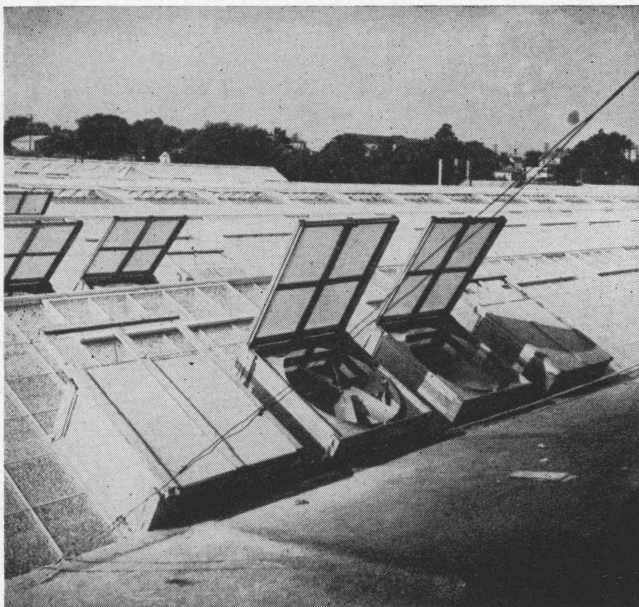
Exhaust fans mounted in greenhouse roof. Hinged lids should be constructed so that they can be raised and lowered from inside the greenhouse.
